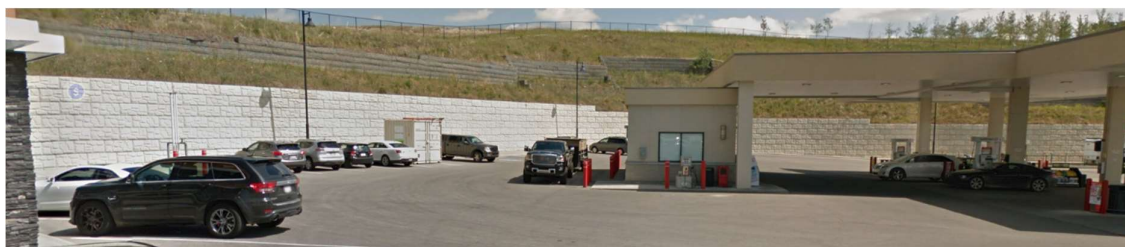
Expected ball diamond retaining wall size. (Located at Aspen Landing Safeway)
